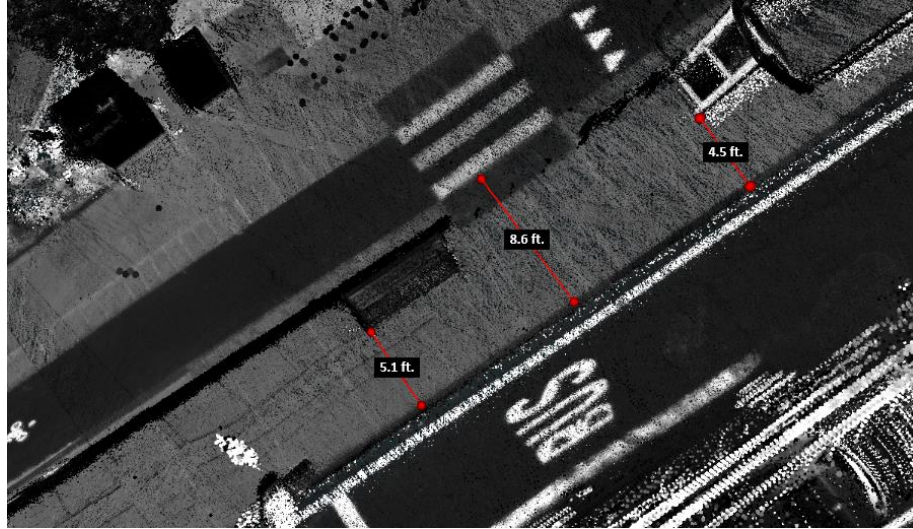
Illustration of the impact of vertical fixtures on platform width measurements at Washington Street at Walnut Street
